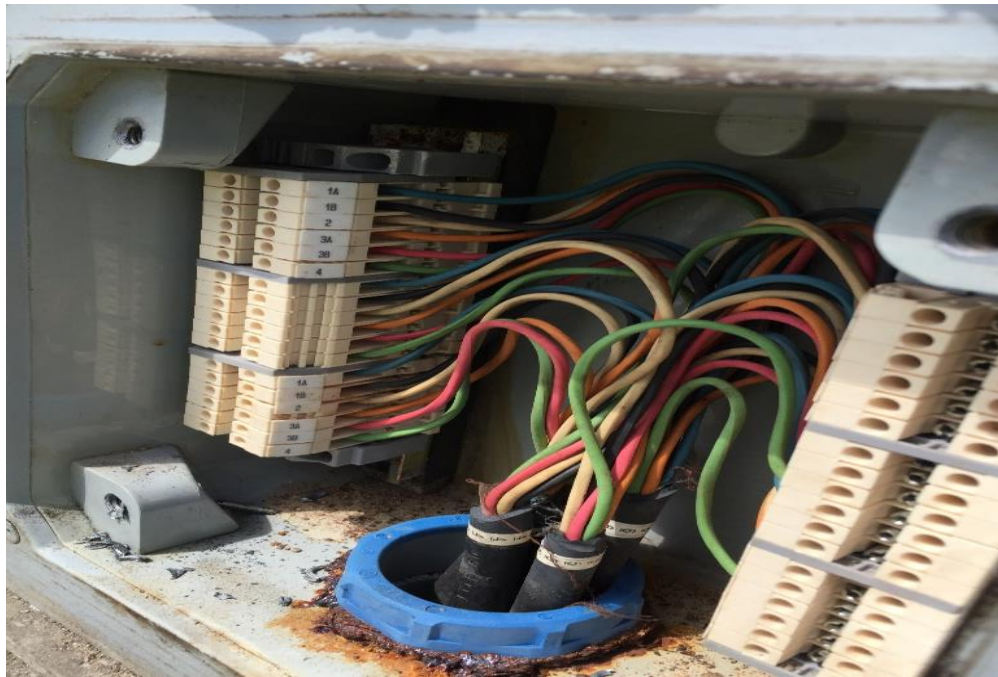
Monitoring Box of Six MEP Sensors Placed in the Parapet of the Bridge
